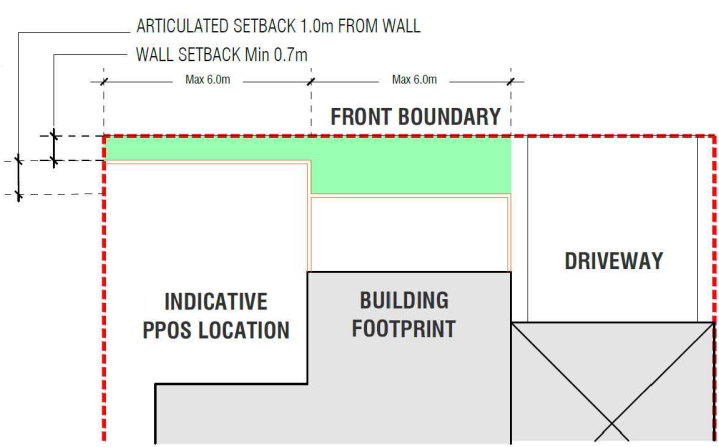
EXAMPLE - COURTYARD WALL, SHOWING ARTICULATED PLANTING ZONE SETBACK
